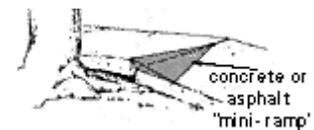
A "mini-ramp" can be used to smooth the uneven surface caused by root damage to pavement.
